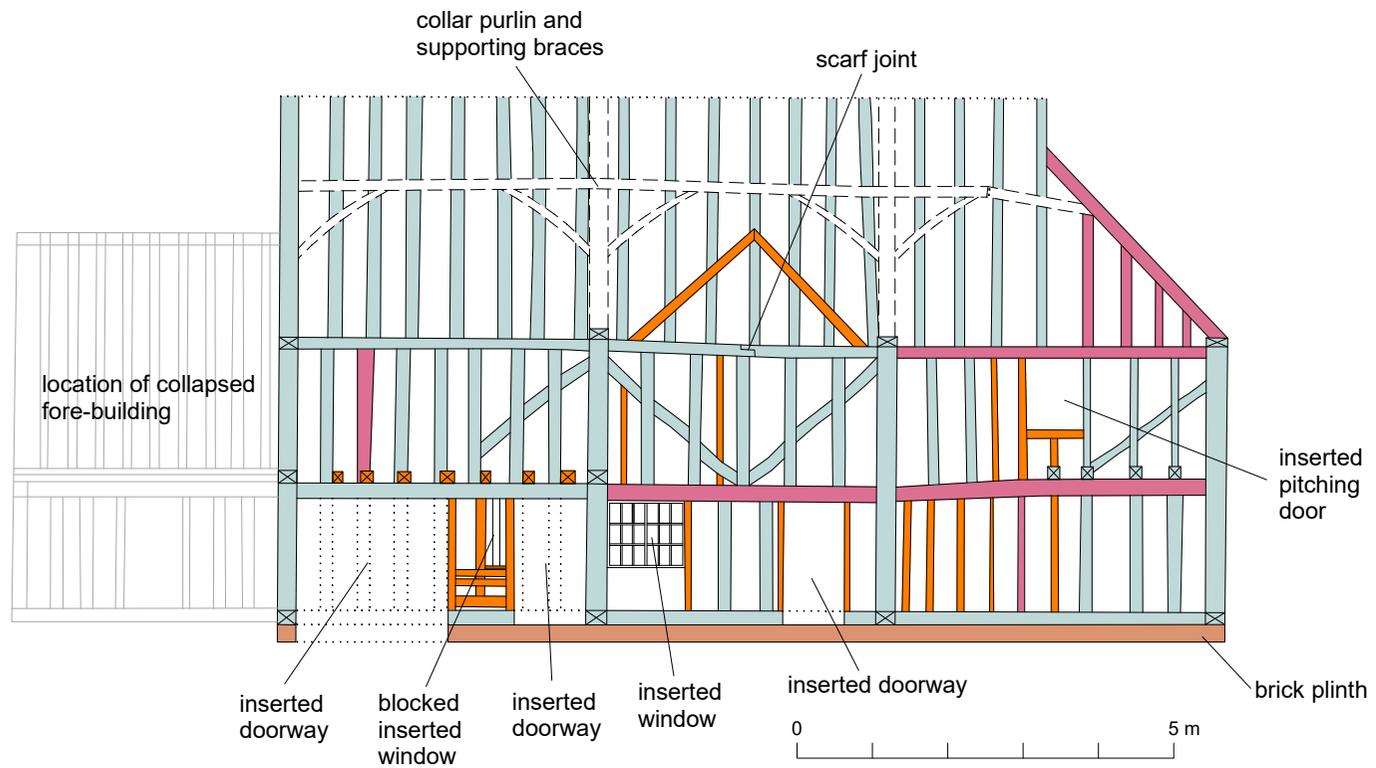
Frame drawing of the west wall of the barn, indicating the locations of original, re-used and replacement timbers.
